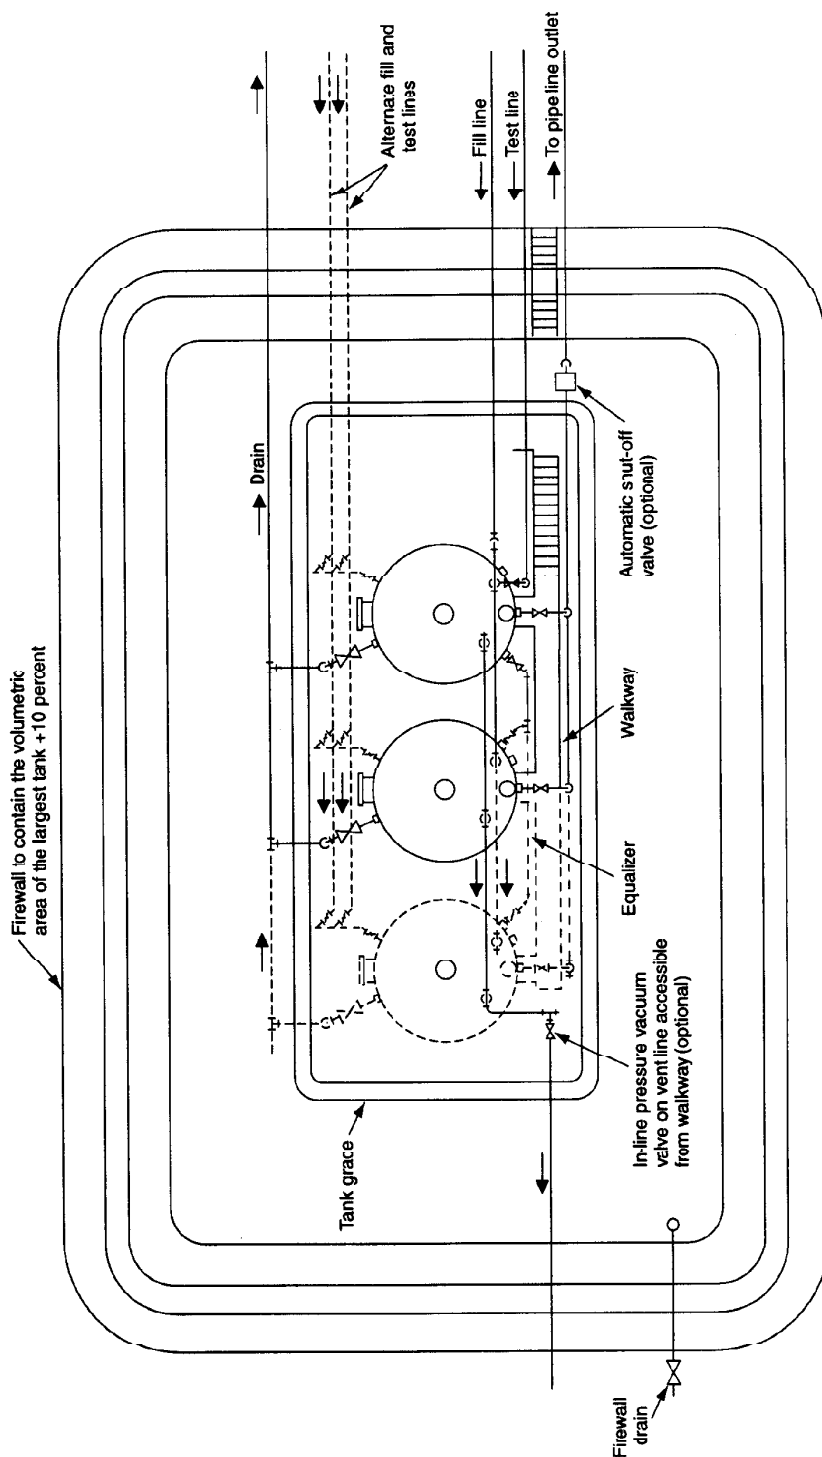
Example of Small Volume Shop-Welded Tanks Foundation and Connection Configurations
